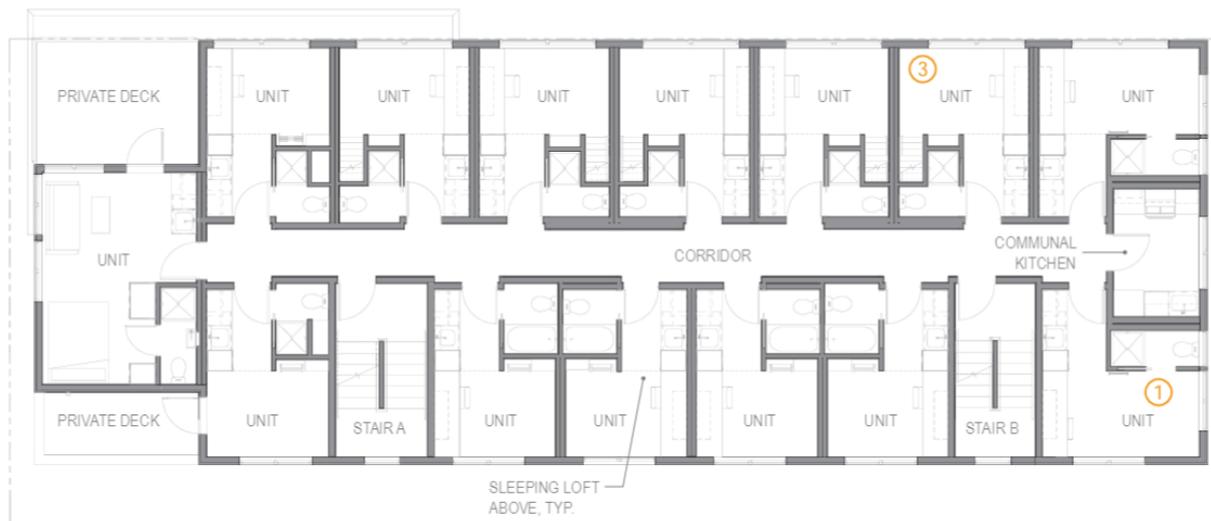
The Roost building. Upper level floor plan. Credit Neiman Taber Architects.
